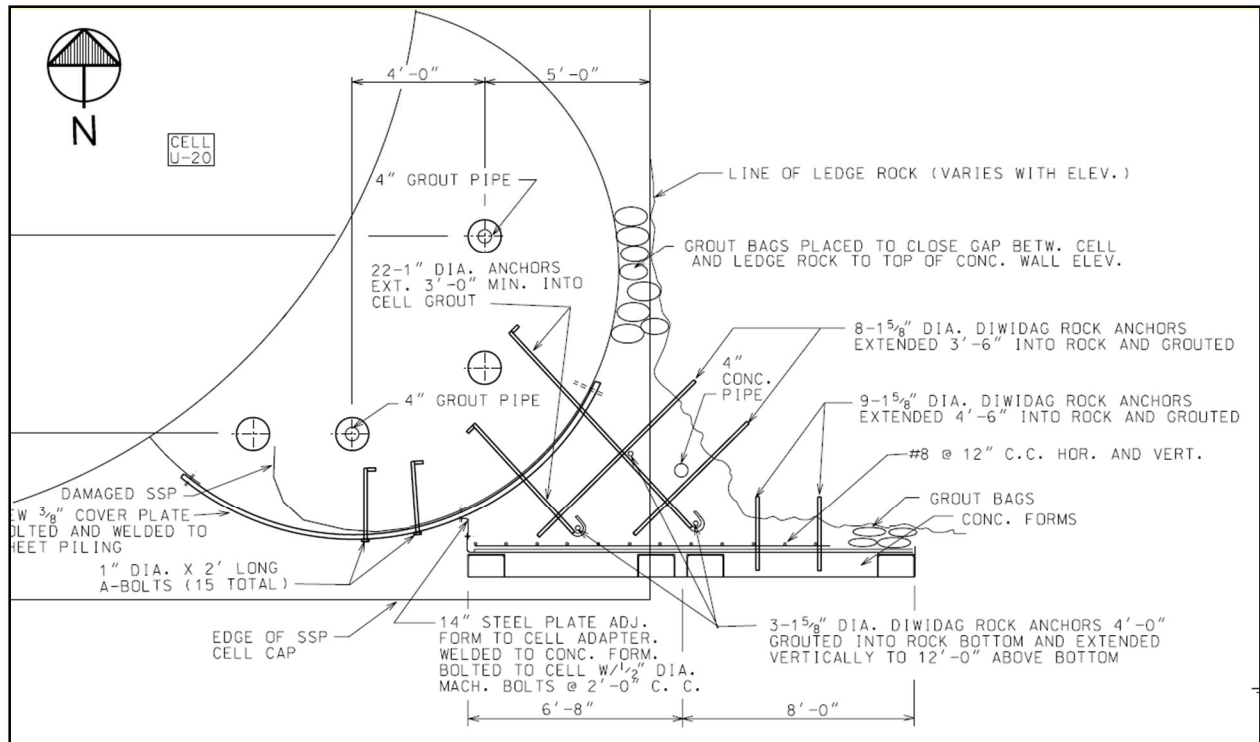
1994 Repair Drawings - Plans (Cell West of 2020 Strike Location and rock ledge below crib #6)
